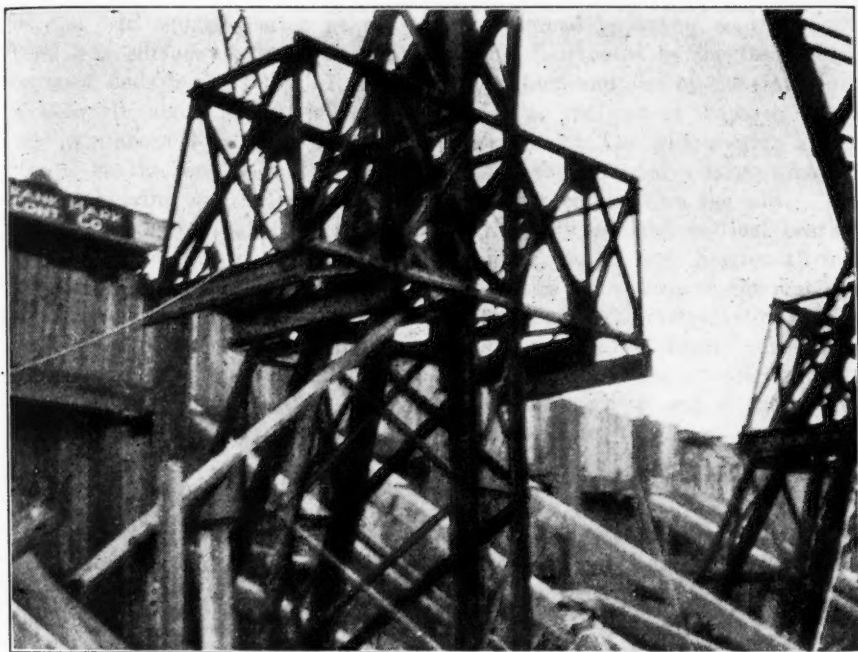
CANTILEVER RIB DESIGNED TO FURNISH SUPPORT IN A TRANSVERSE DIRECTION.
